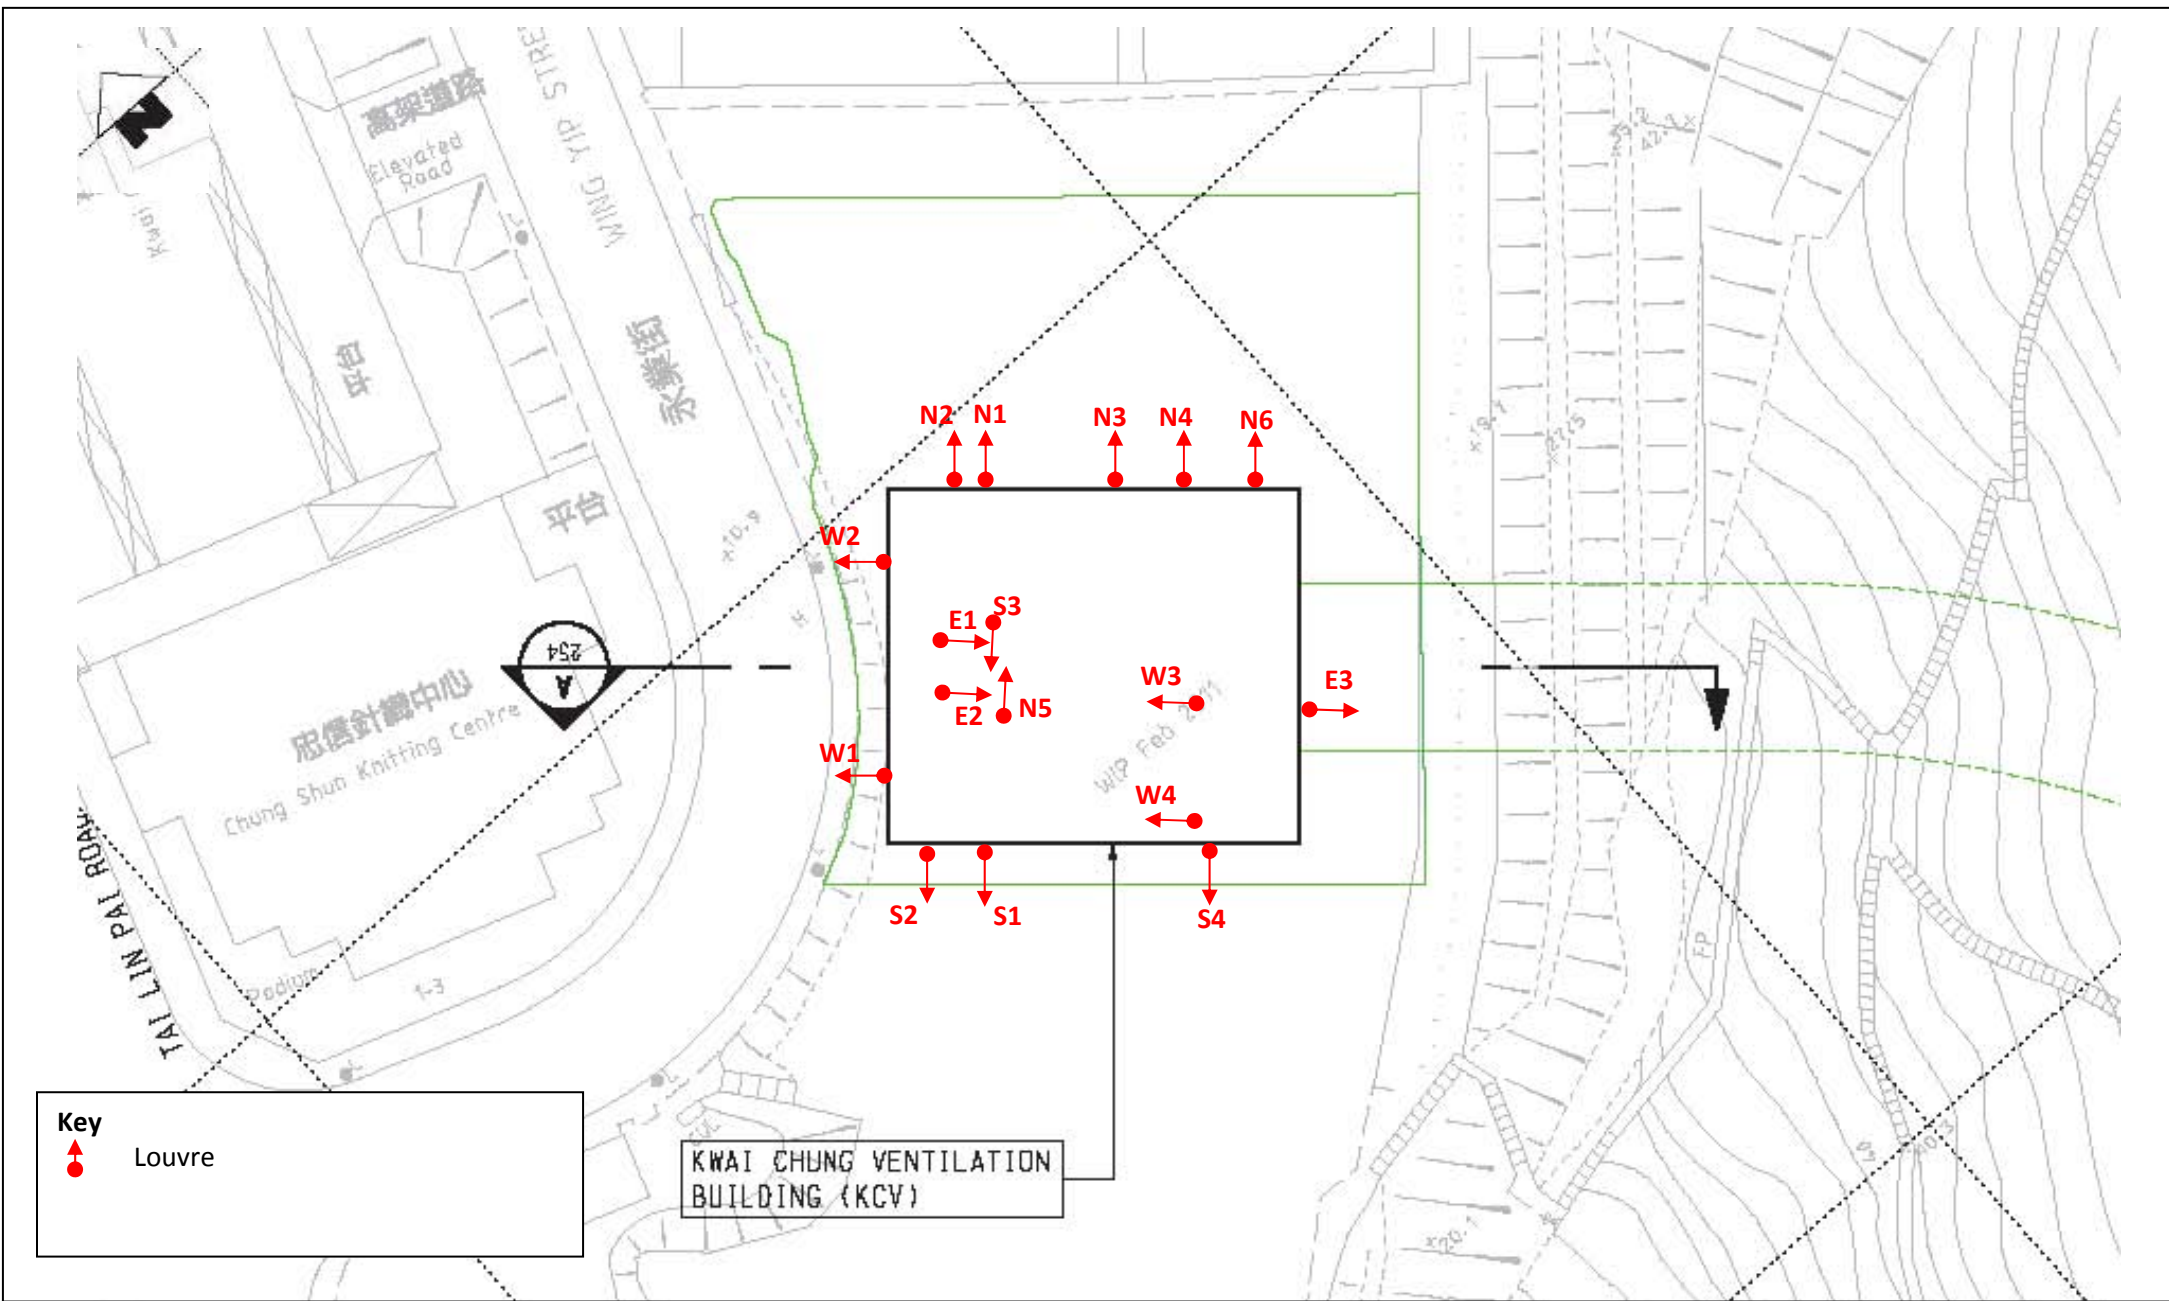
Site layout and Fixed Plant Sources at KCV
